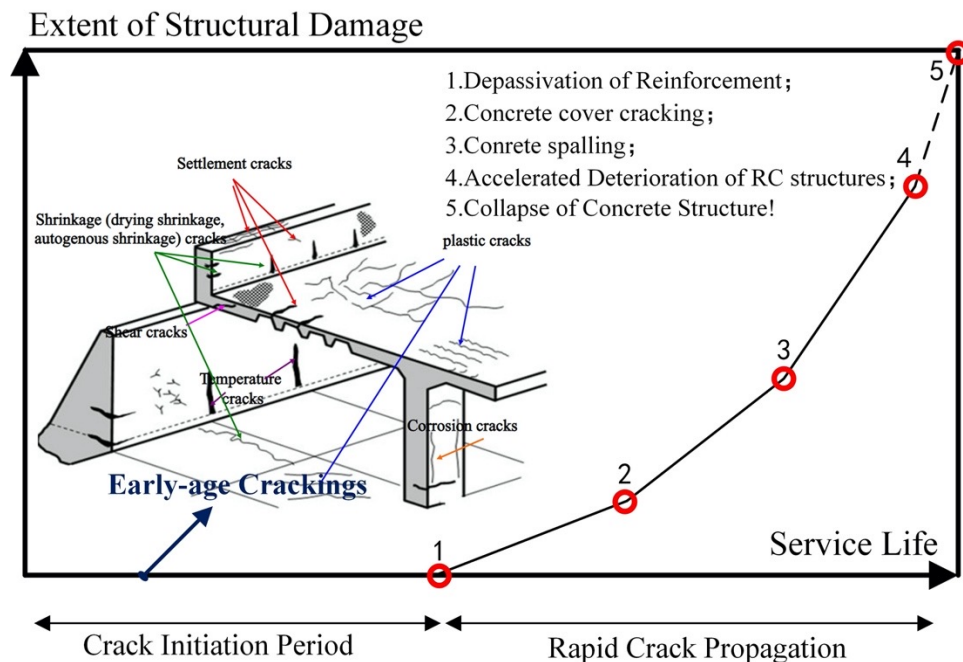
Impact of early-age cracking on life span of concrete structures, corrected from (*Non-structural Cracks in Concrete, Cement and Concrete Society, United Kingdom, 1978*)
